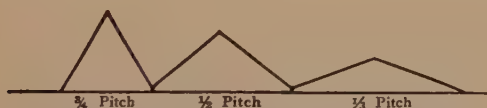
Fig. D.—Various pitches of roofs. See text for roof measuring data.—(Courtesy The Lehon Co.)
